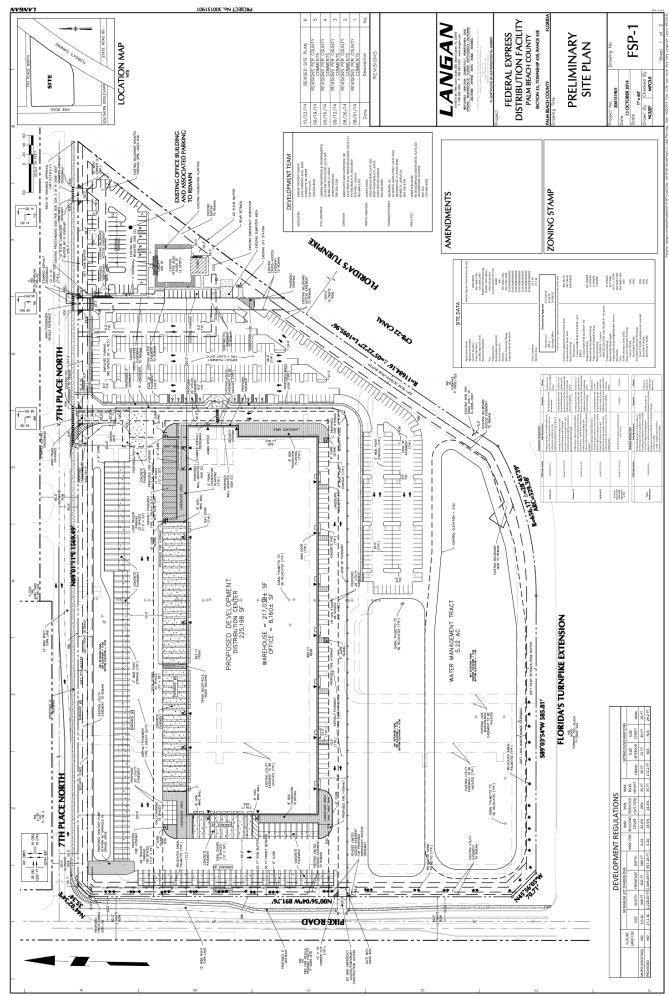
Previously Approved Preliminary Site Plan dated October 22, 2014
